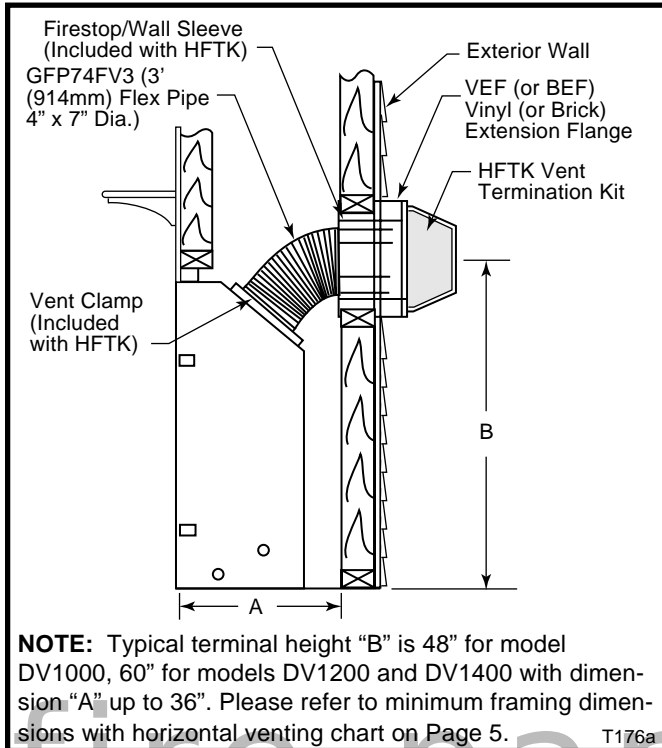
Typical direct vent gas fireplace with horizontal venting.
